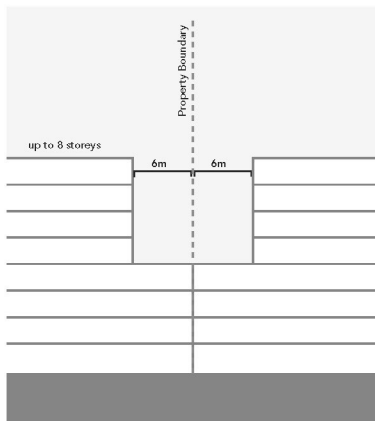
Preferred side separation for buildings over 8 storeys built to boundary
